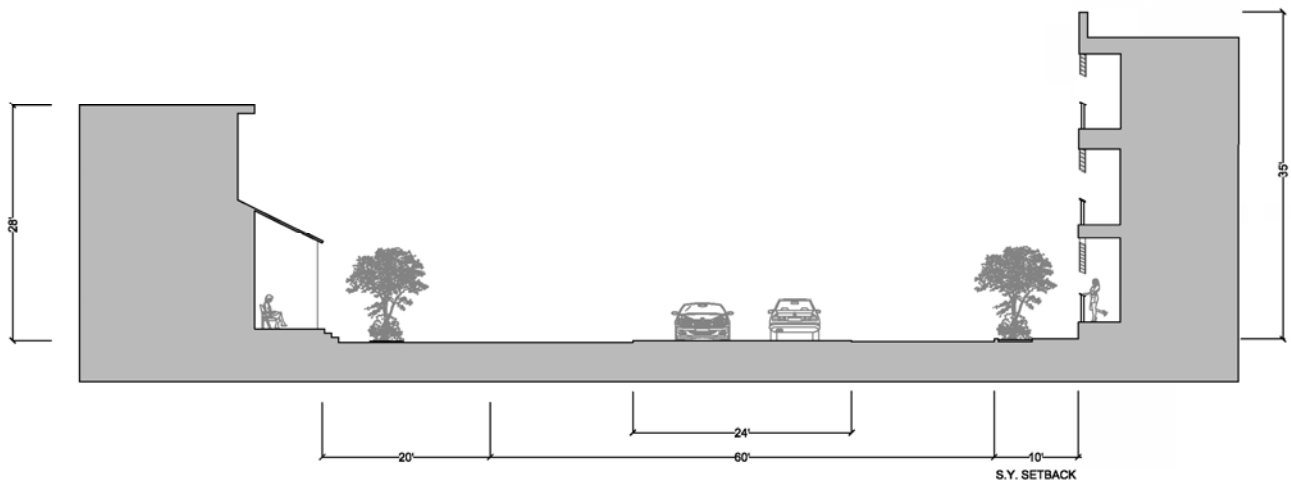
New building height setbacks covered and screened by an awning and a louvered balcony.
